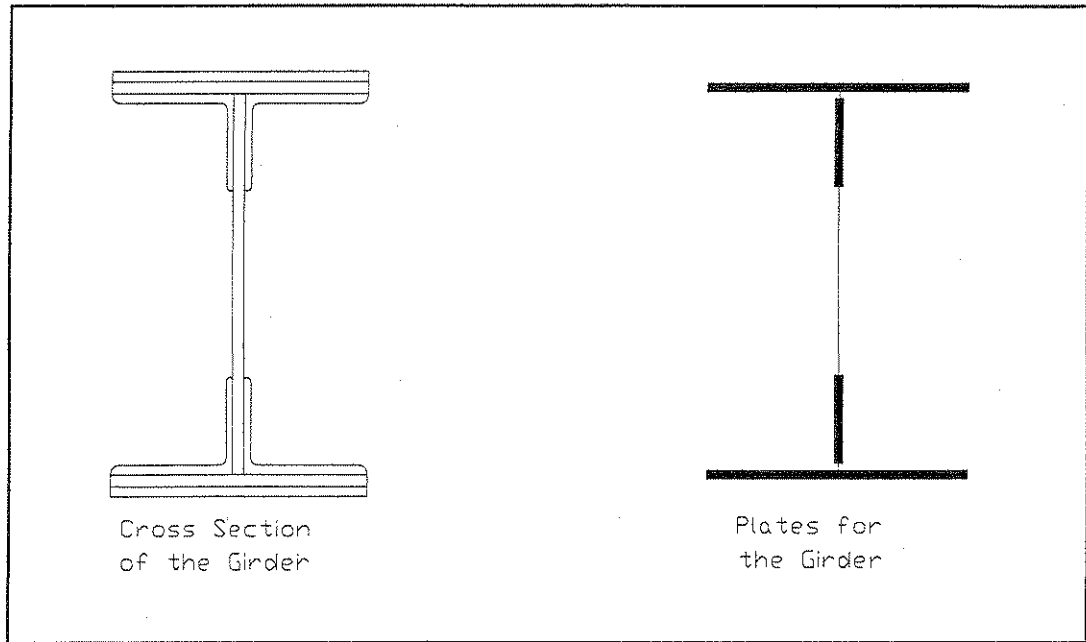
Cross Section of Main Girder with a Model of the Plates.
